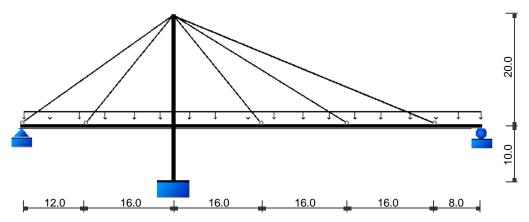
Configuration at the final stage of an asymmetrical cable-stayed bridge
